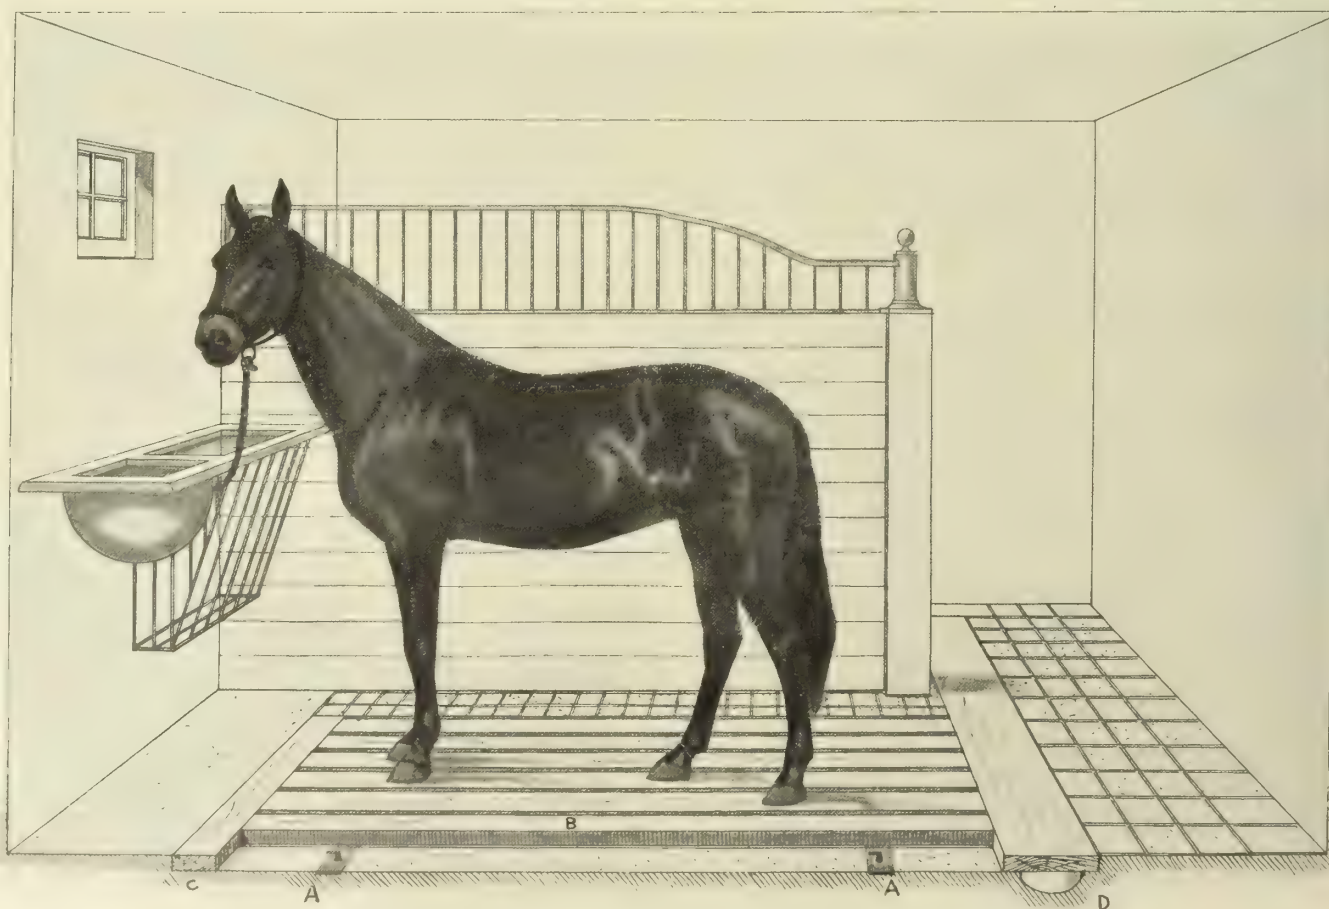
SCHOULER'S PATENT SANITARY STALL FLOOR
